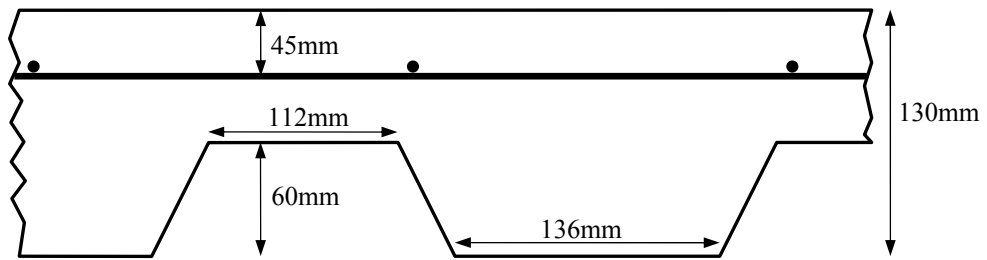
Concrete slab cross-section, showing the trapezoidal decking profile
